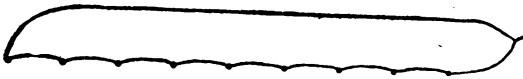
Plan of Wire Connections for Blasting a Narrow Ditch Through Dry Ground.
